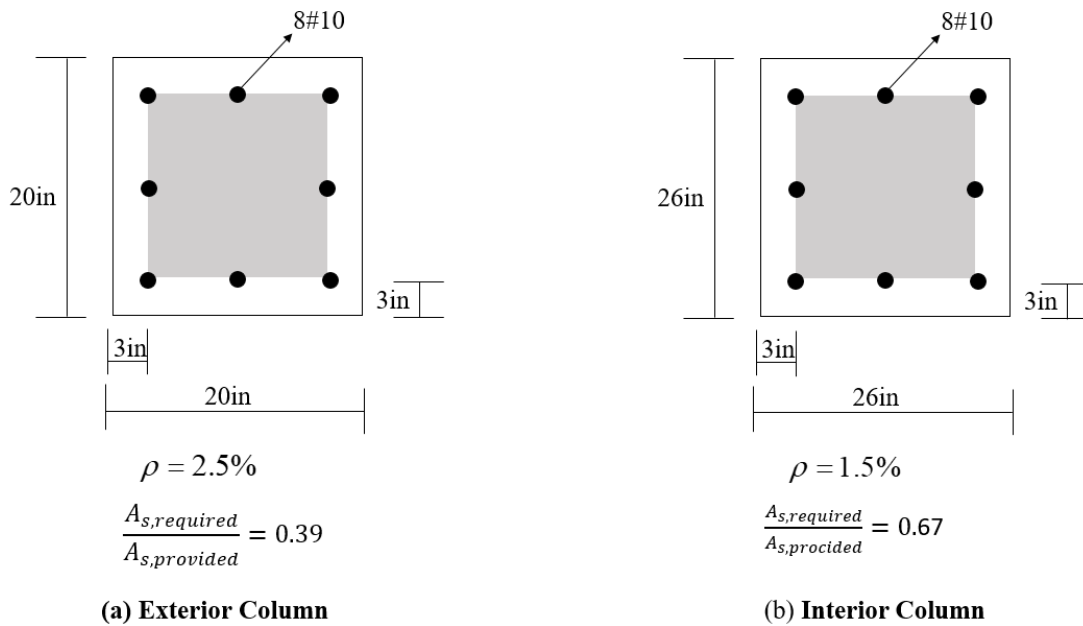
Reinforcement and geometric details of the exterior columns and interior columns
